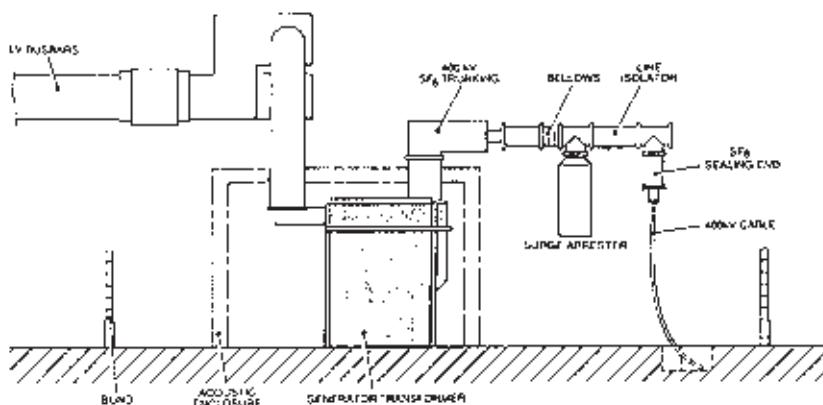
Simplified arrangement of 400 kV SF₆ connection to generator transformer
